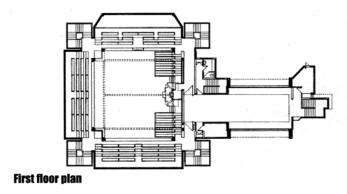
First floor plan of the Dutch Reformed Church Welkom West (Peters & Kotze, 2013:37).
